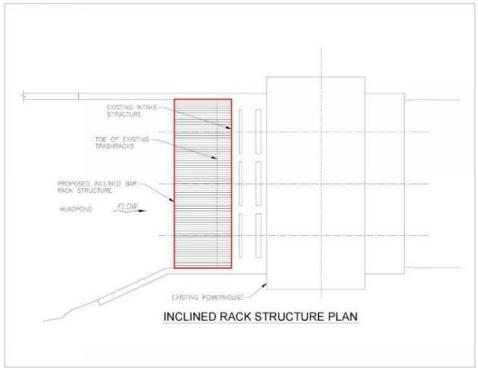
INCLINED TRASHRACK STRUCTURE - PLAN VIEW
